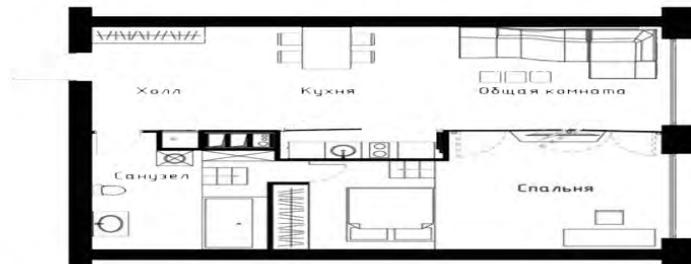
(e) (Plan of Modern Apartment with Transforming Sculptural Wall)
